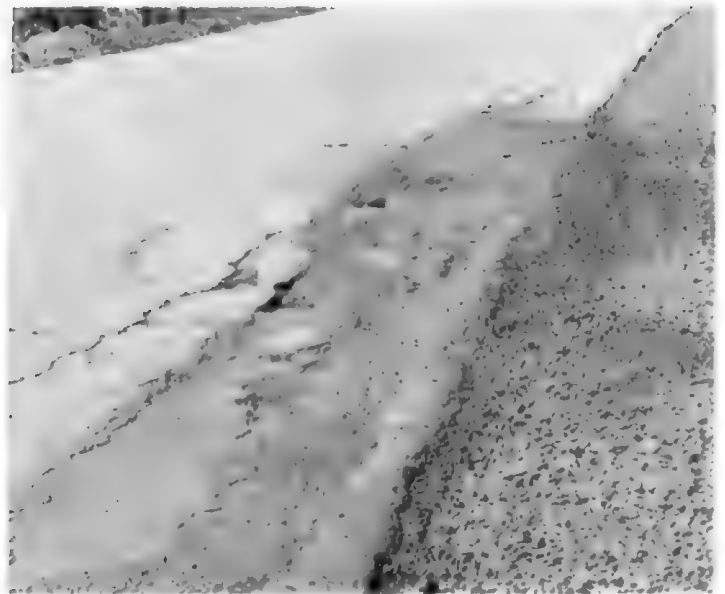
This pavement on Ernest silt loam has been damaged by a seasonal high water table and frost heave.
